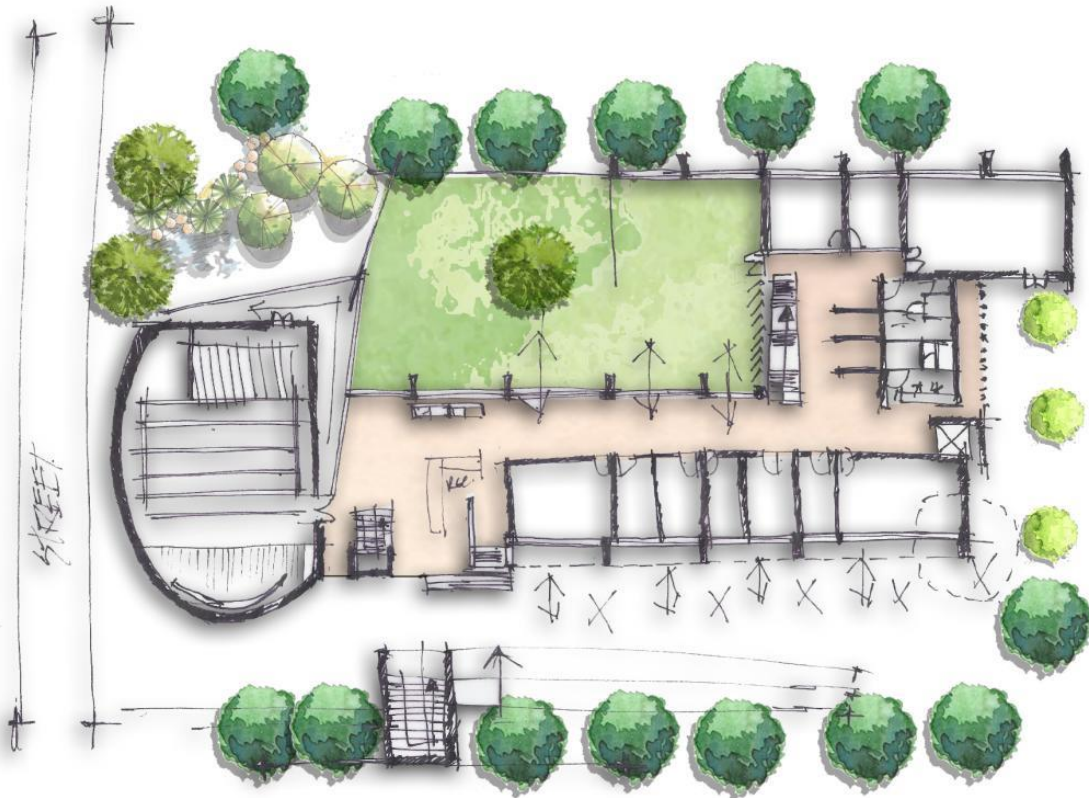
Site Plan - TUT Department of Architecture , Scale: 1:250 (Author 2020)
